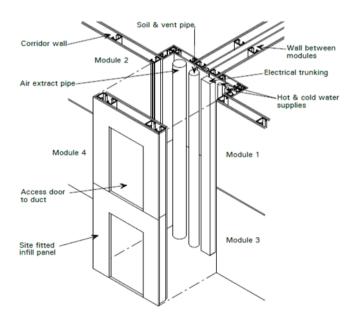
Service Duct in a Modular Hotel (SteelConstruction.info, 2012).
